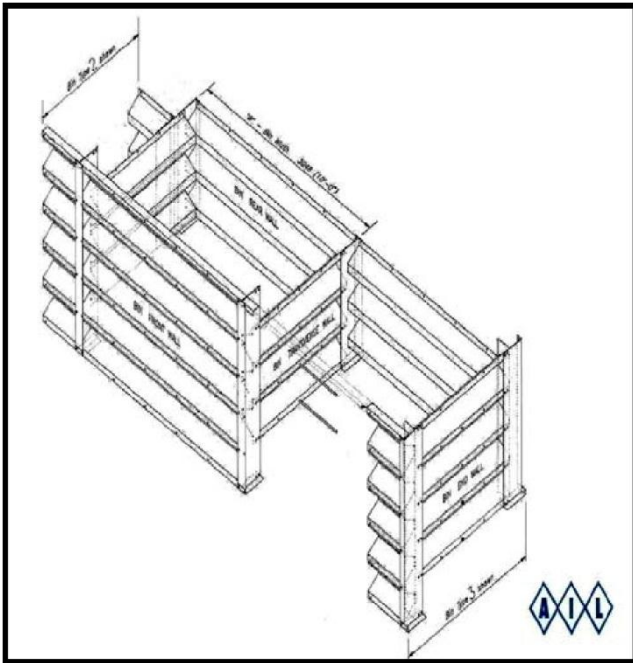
Front view of Bolt-a-Bin AbutmentConstructing a bridge
